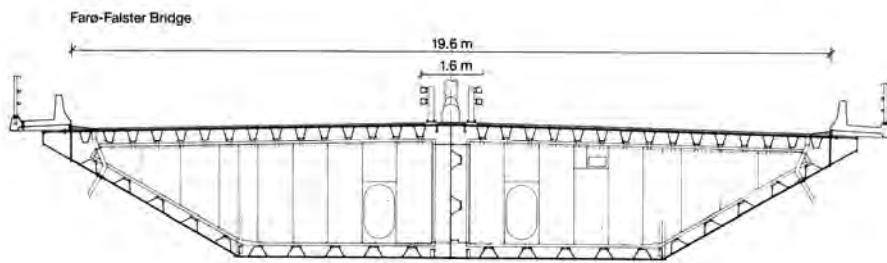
Cross-sectional view of the steel girder of the Farø Bridges.
